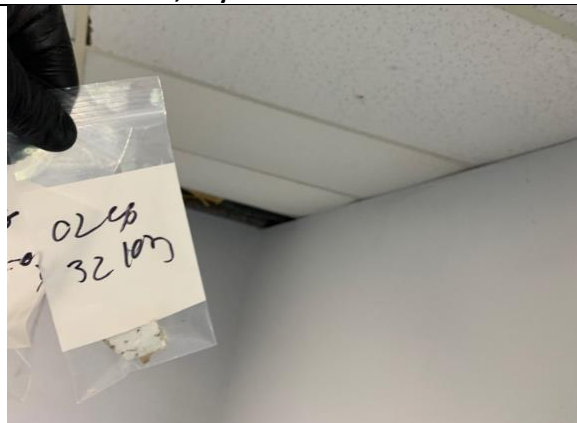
Photo of HA number 32, Sample No. 0206-32-103 | Non-ACM White 2'x4' Ceiling Tile, within Open Room
